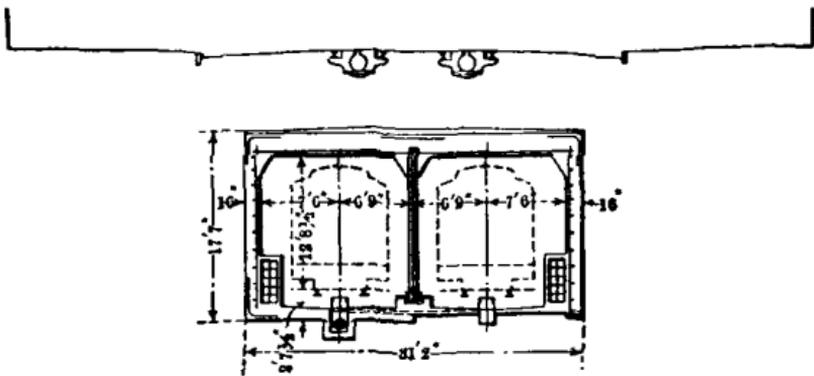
New York Rapid Transit Subway. Typical 2-track section, Lexington Ave.
